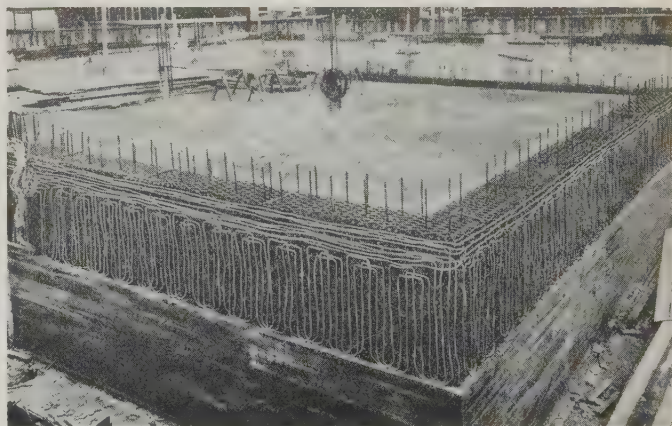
A bank vault under construction, showing the protective "lacing" of several multicircuit cables embedded in the concrete
